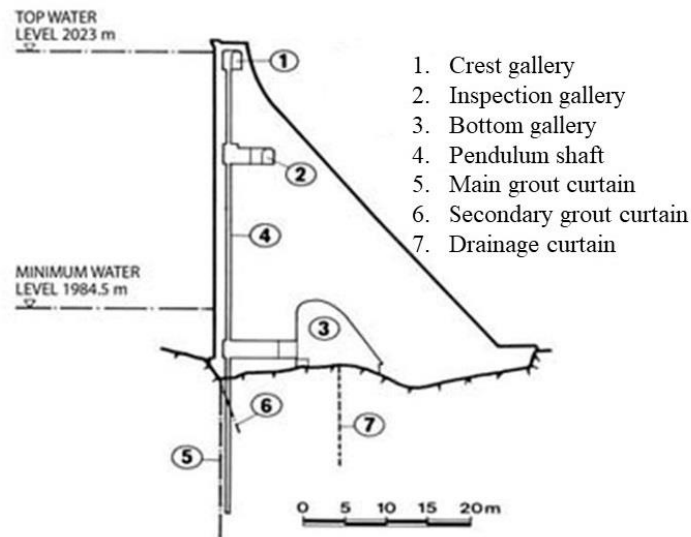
Gravity dam cross section, indicating the location of grout curtain and drainage system
